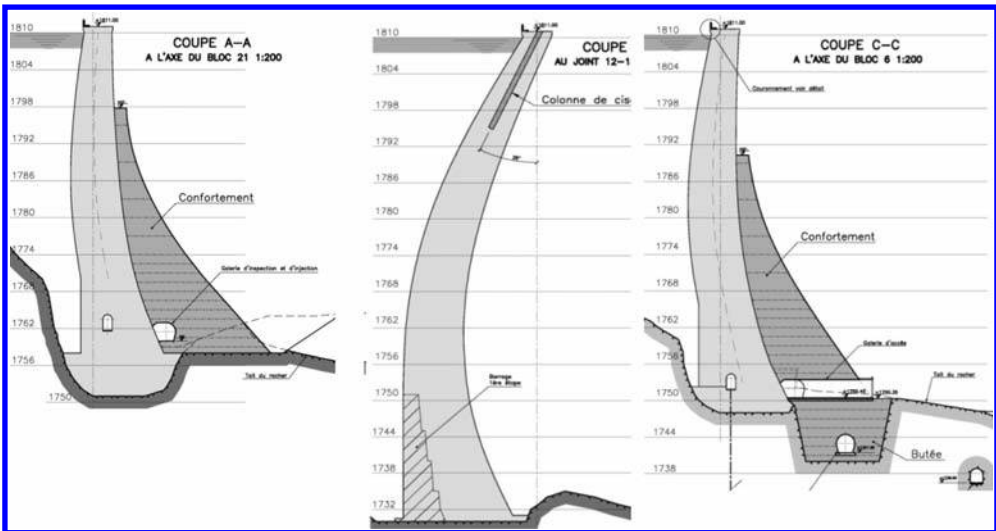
Cross-sections of existing dam with strengthening solution. Left: Bloc 21 with abutment thickening; Center: Shear keys from the crest; Right: Bloc 6 with abutment thickening and a 10 m deepening into the rock foundation.
